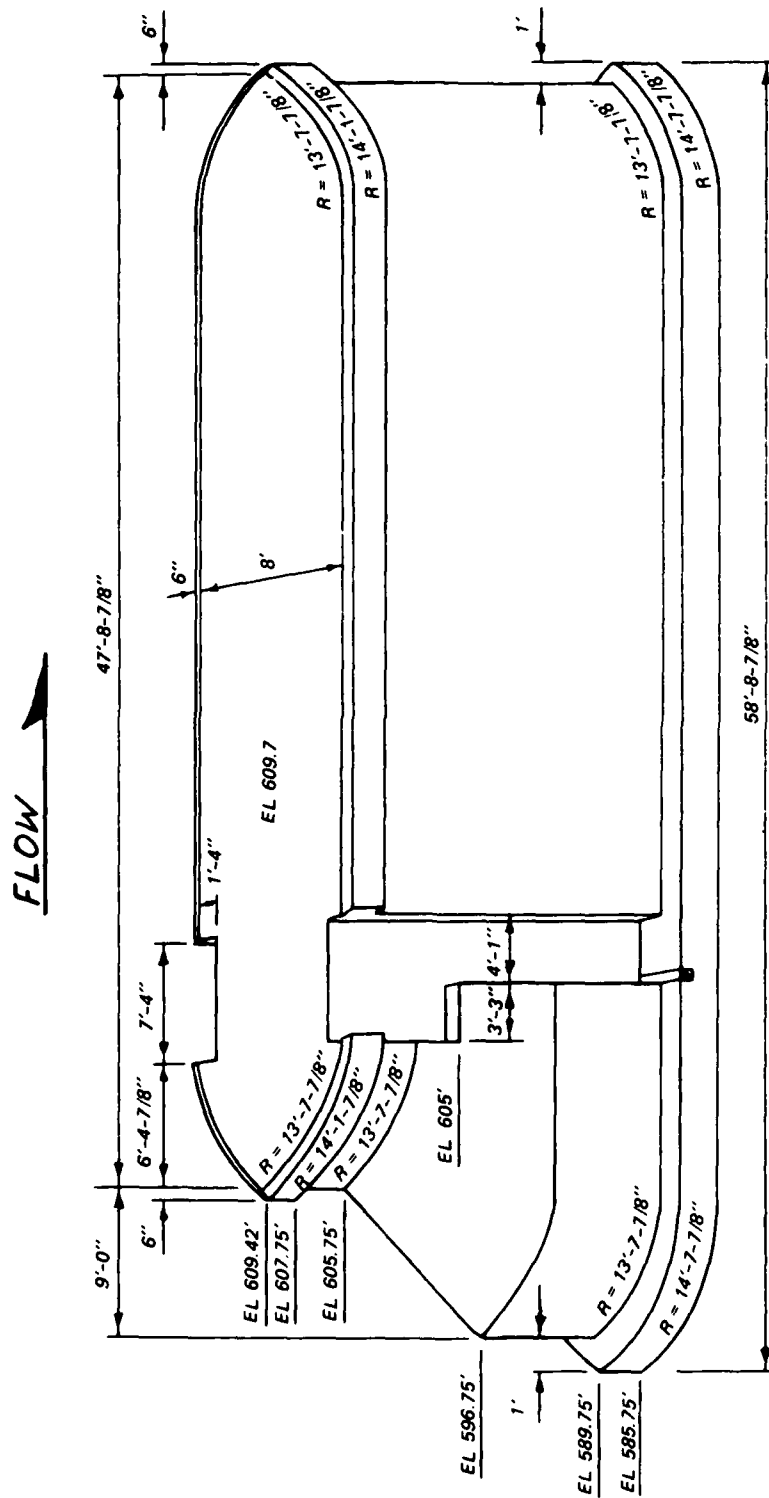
Typical geometry for dam piers 10, 11, 12, 14, 15, and 16, Soo Dam
